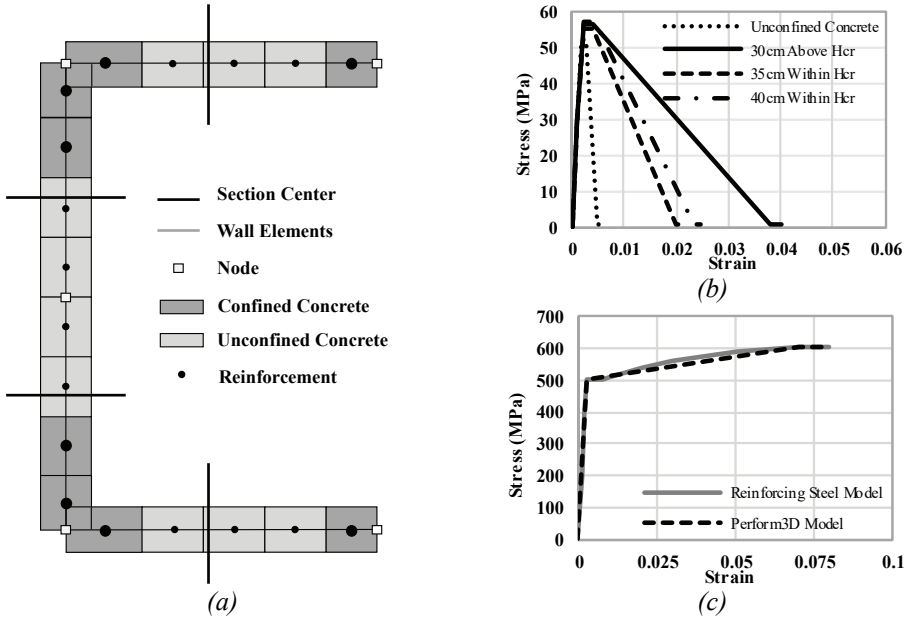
Modeling of structural walls with the distributed plasticity (fiber modeling) approach in Perform3D: (a) fiber discretization of the wall cross-section (b) concrete stress-strain backbone curves (c) reinforcement stress-strain backbone curve
